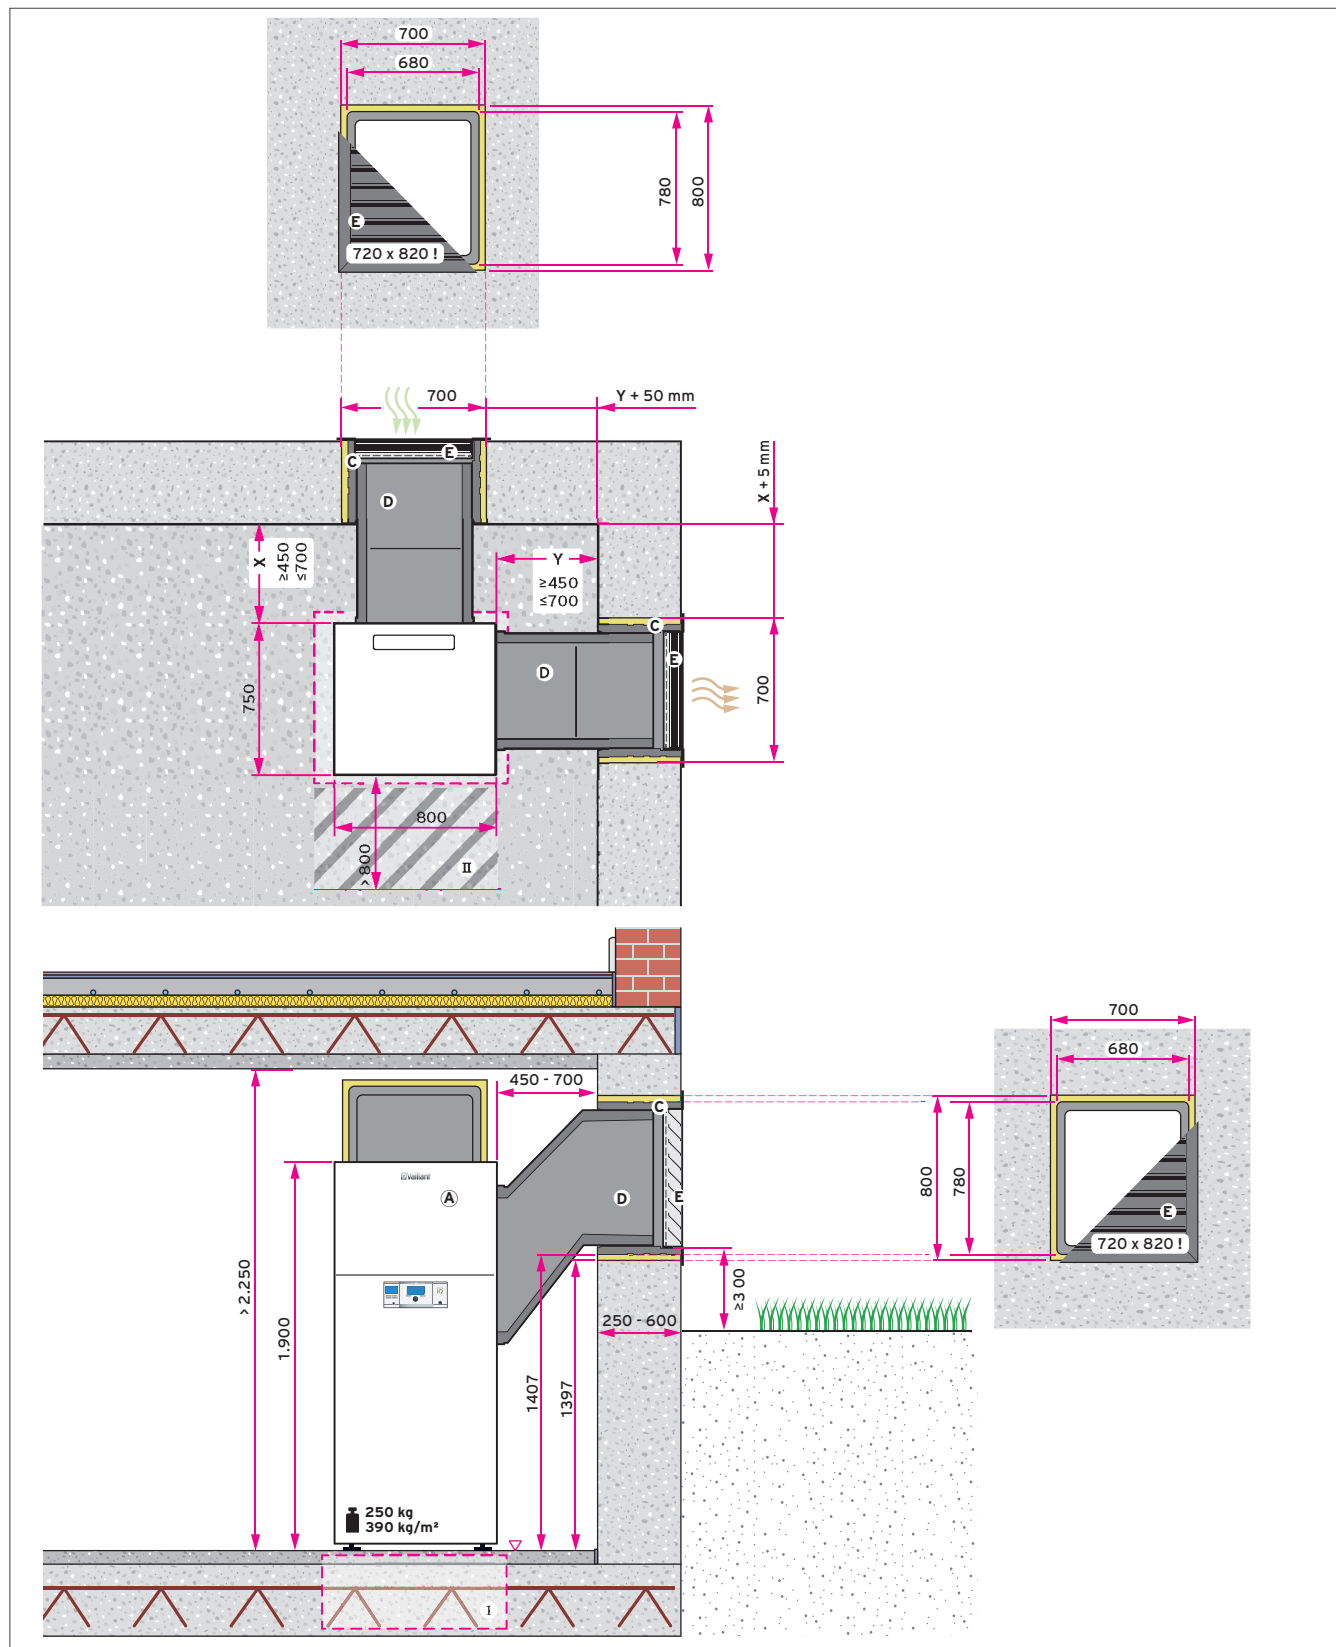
versoTHERM installation situation, ground floor - right-hand installation in the corner of a room, air supply via cellar adapter
